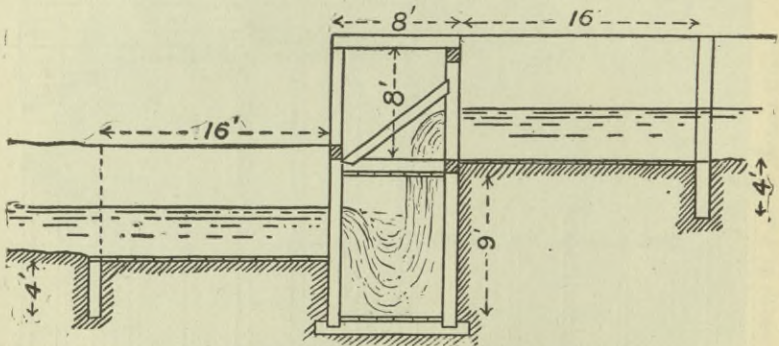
CROSS-SECTION OF FALL, TURLOCK CANAL.
